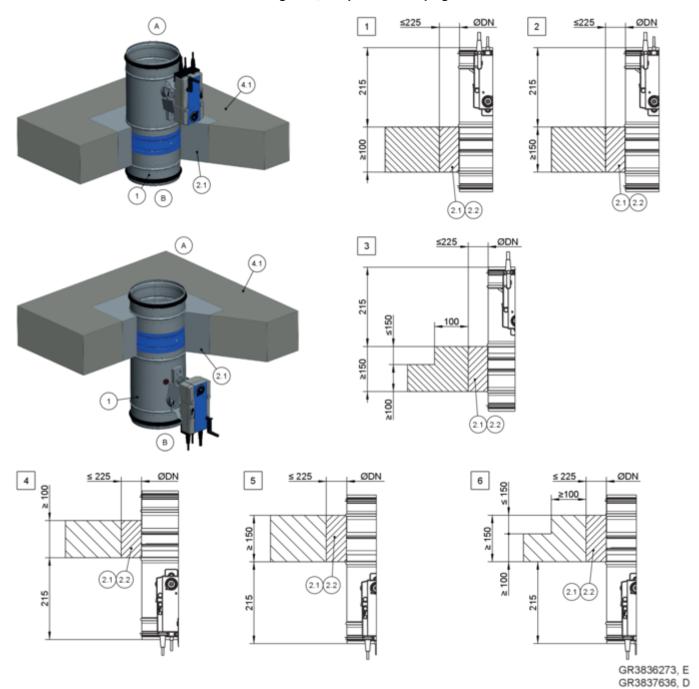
Mortar-based installation into a solid ceiling slab, suspended or upright
